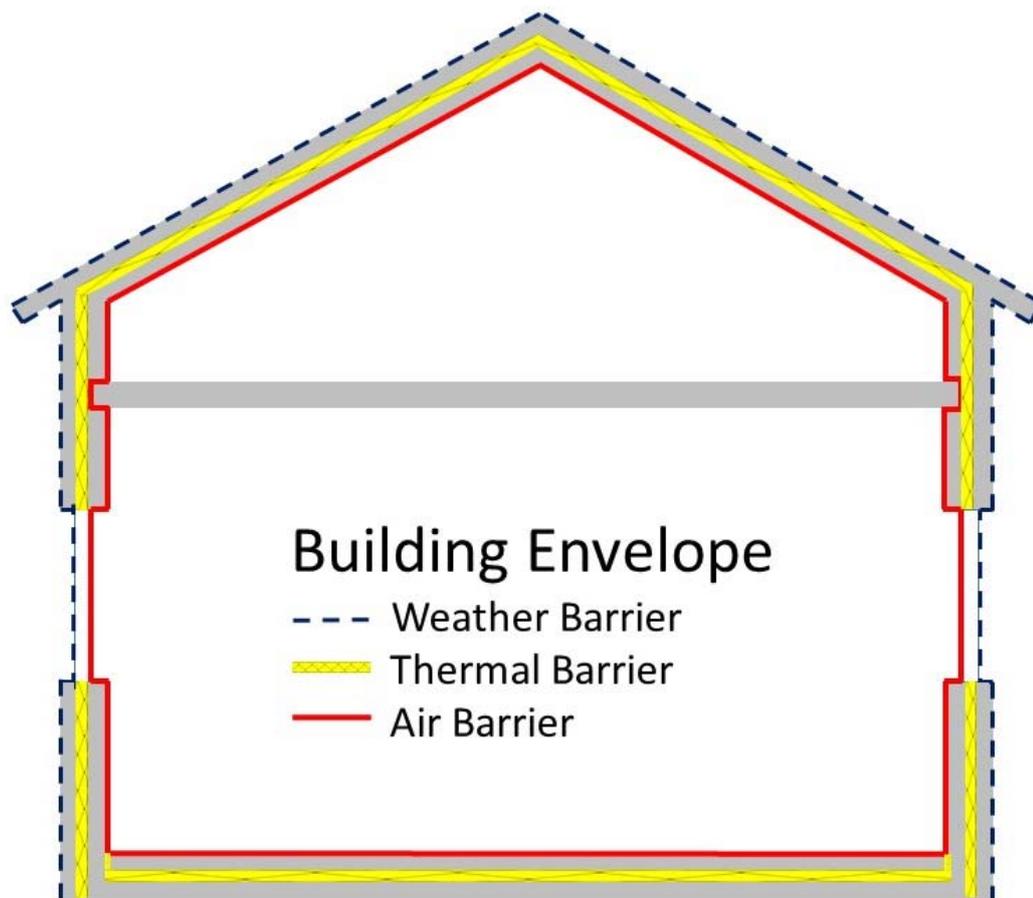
Building envelope showing position of weather, thermal and air barriers
